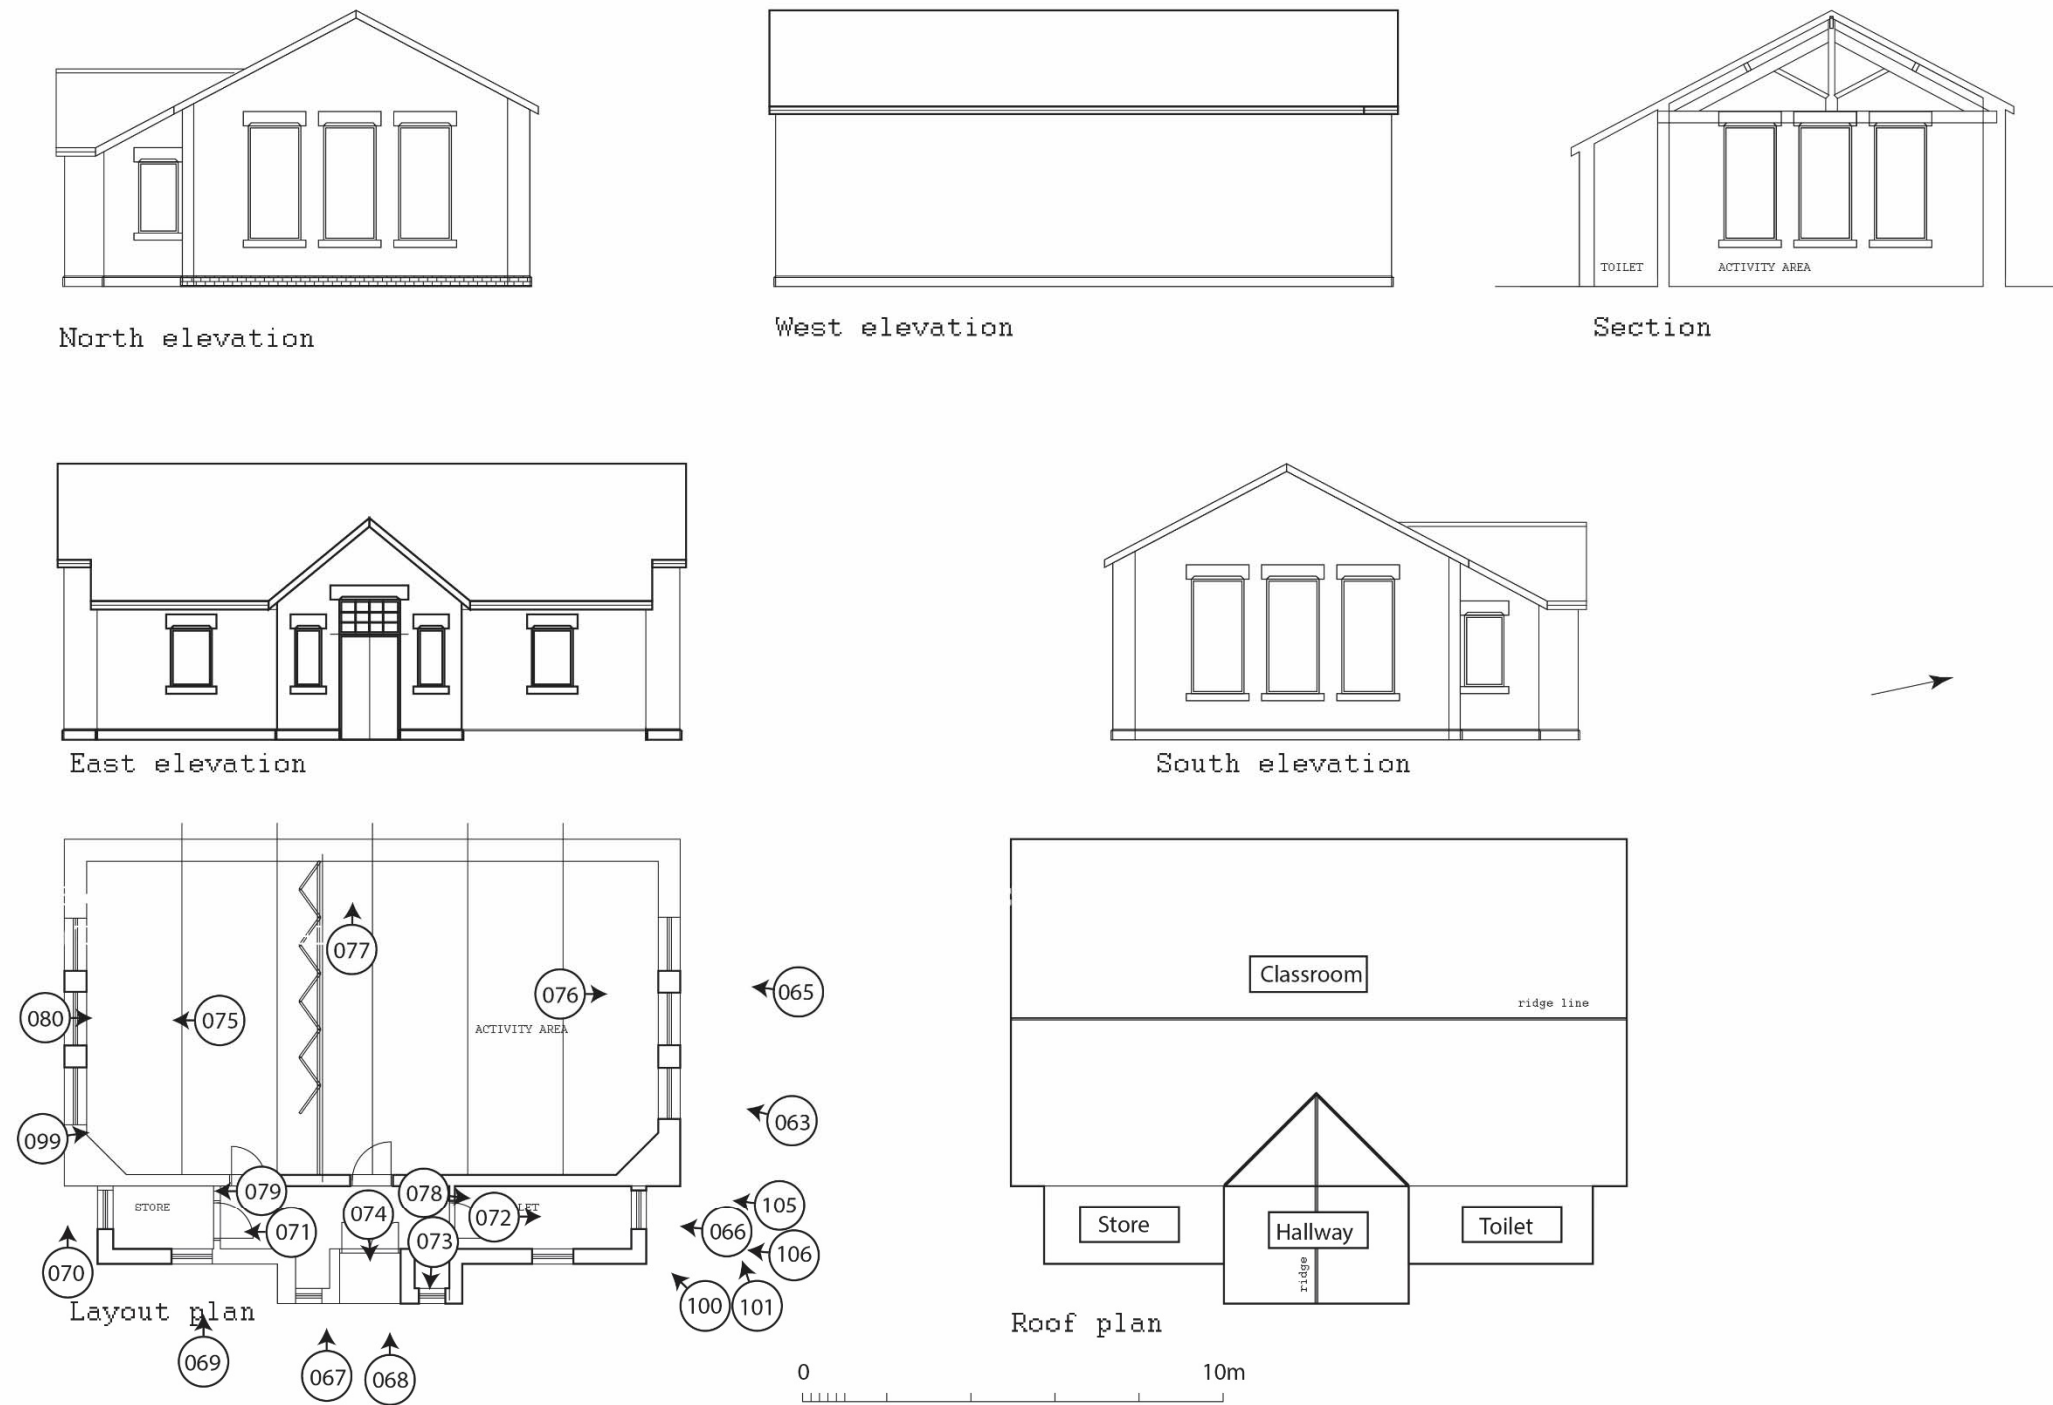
Plans and elevations of infant school showing photographic locations and orientations (based on architect's plans, courtesy of Glyn Smith)
